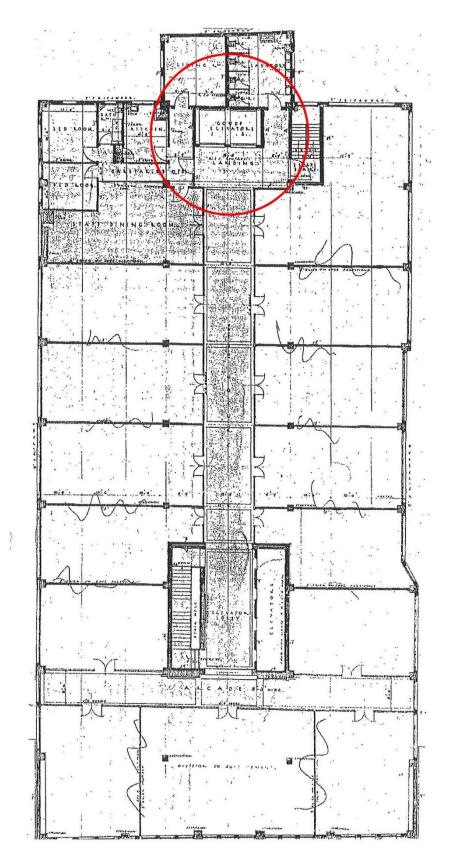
Dymocks Building, First Floor Plan, 1928, with the "Goods Elevator" shown circled in red and Lavatory adjoining to the east (Source: Dymocks Archives)
